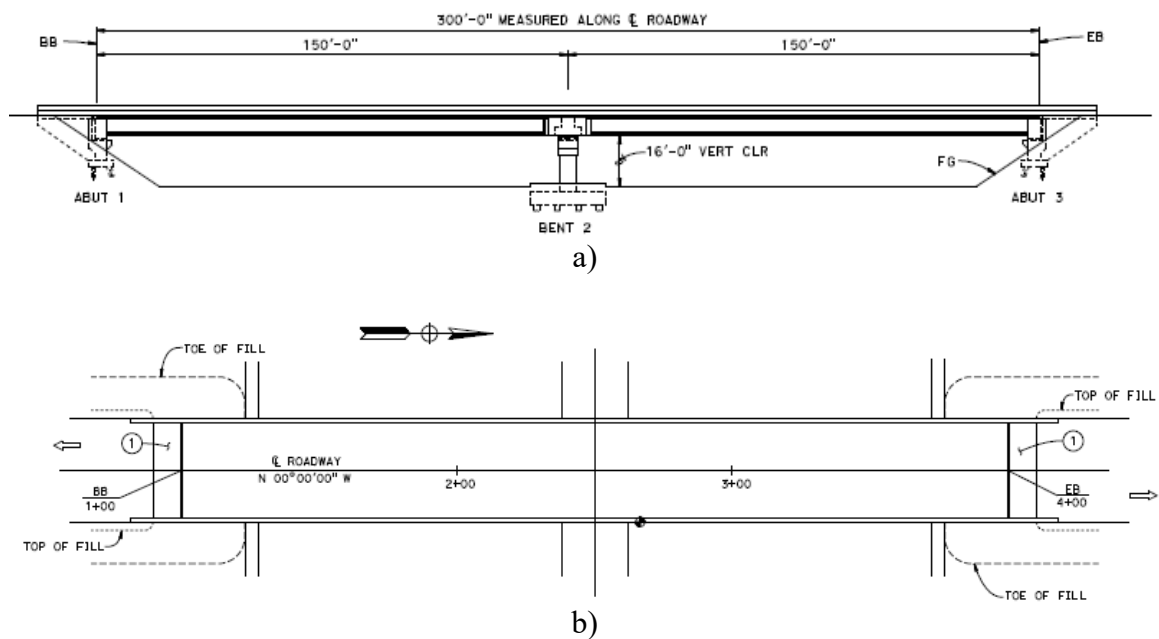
Schematic of OSB4 (drawings provided by Caltrans): (a) Elevation view; (b) Plan view
